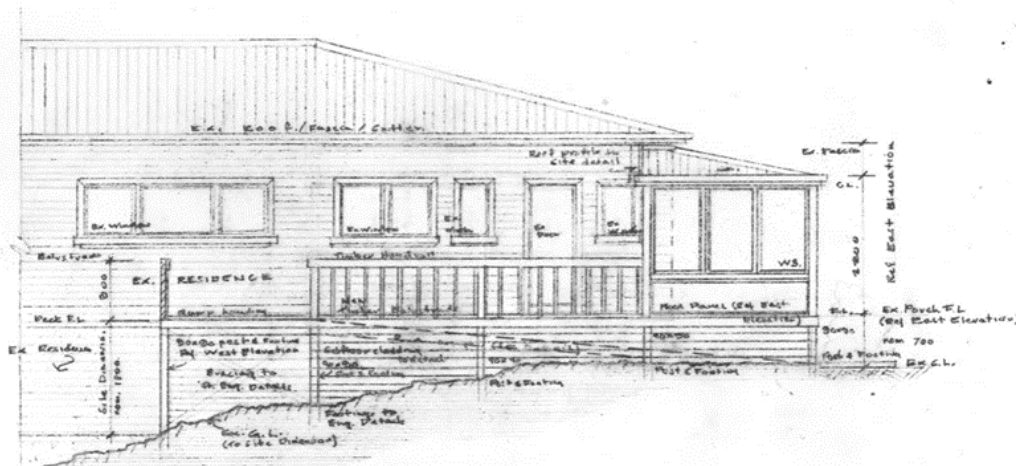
Dwelling at 10 Munro Place showing the southern elevation facing the northern boundary of 12 Munro Place.
